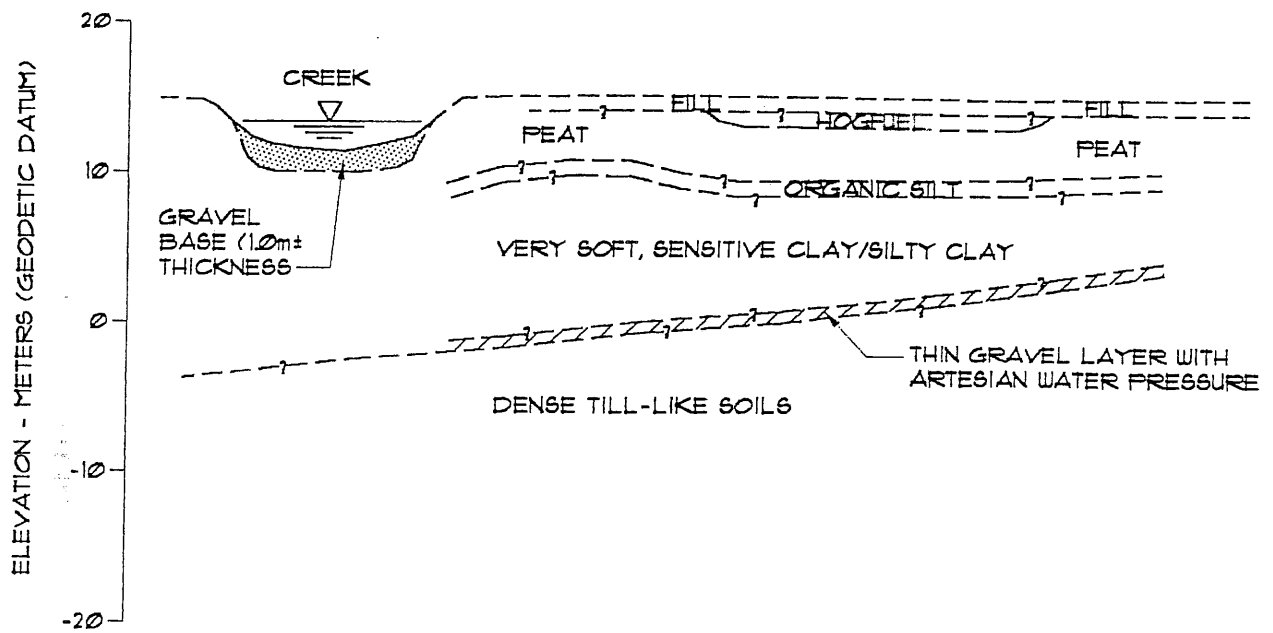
Generalized Subsoil Profile - East-West Section Through the Creek Wellington Area, Burnaby, British Columbia.
